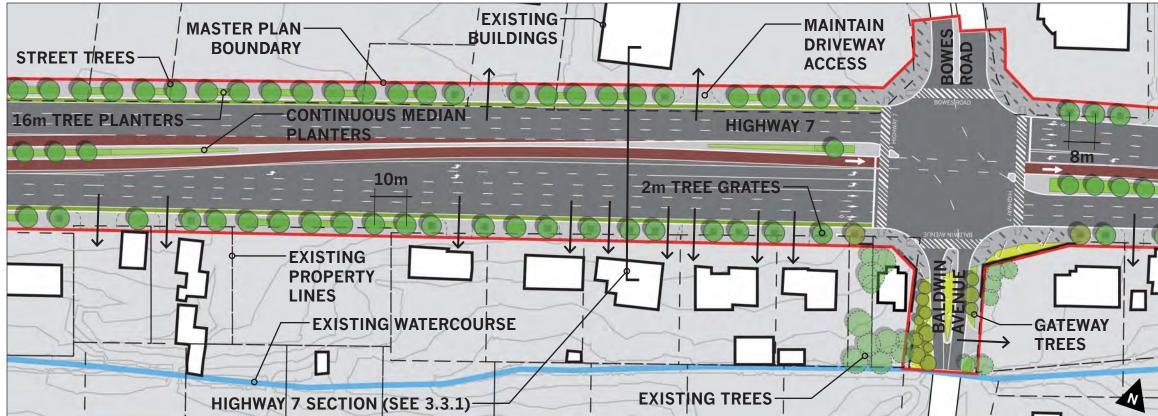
Highway 7 streetscape concept plan detail.
